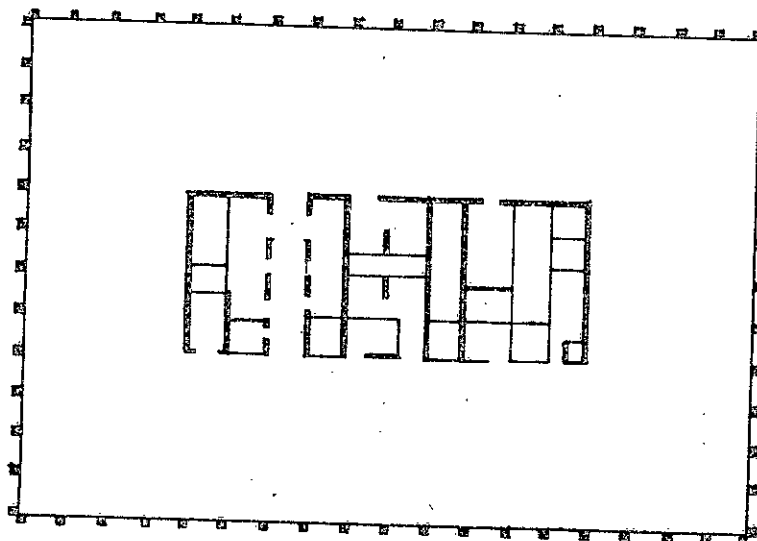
(d) TYPICAL FLOOR PLAN OF BRUNSWICK
